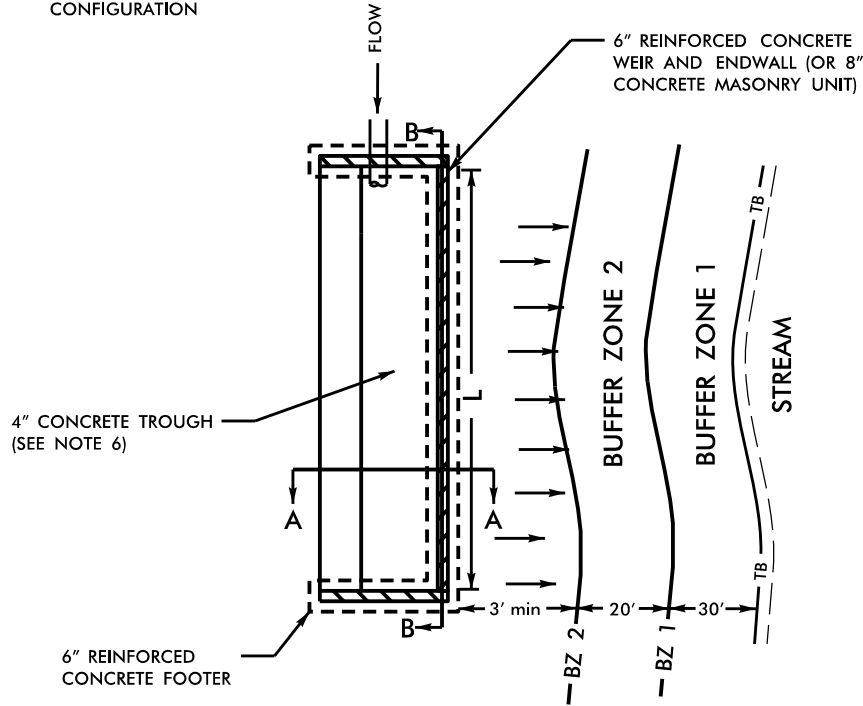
DETAIL ? LEVEL SPREADER w/CONCRETE TROUGH
